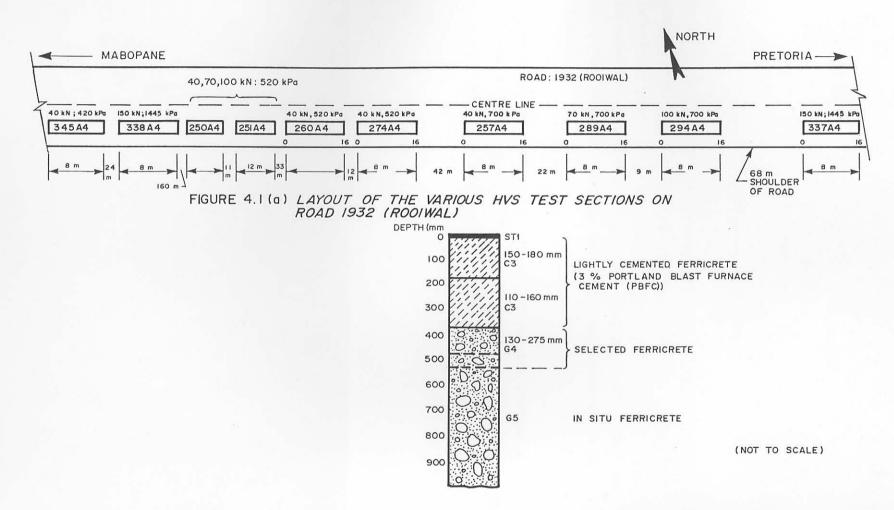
(b) DETAIL OF THE RELATIVELY DEEP PAVEMENT STRUCTURE AT THE HVS SITE (km 2,9) ON ROAD 1932, NEAR ROOIWAL
